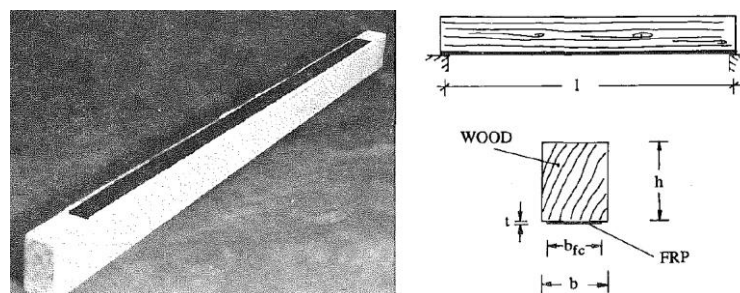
FRP-reinforced timber beam (Plevris and Triantafillou 1992).
